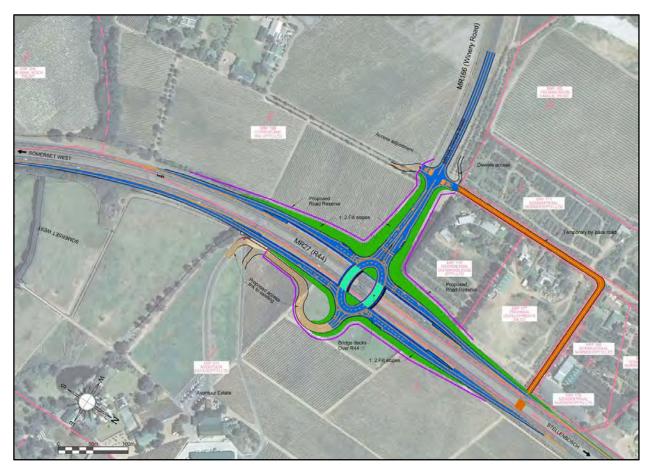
Proposed grade-separated roundabout at the Winery Road Intersection with fill slopes (K&T, 2015)
